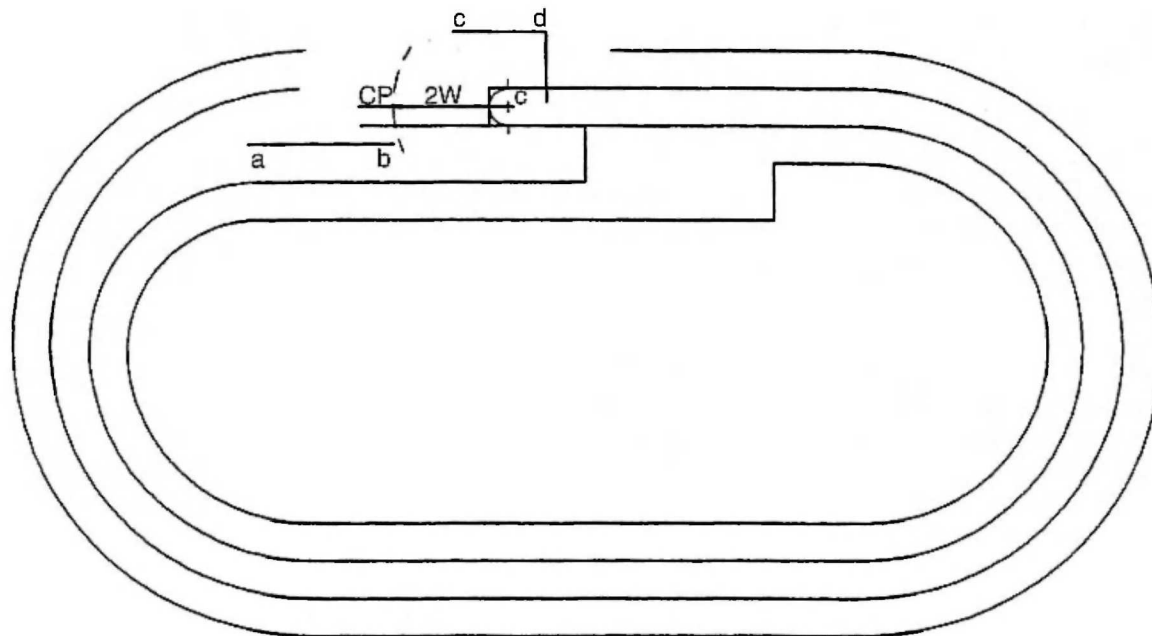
Crest lines and the crest point for bench 2 (Step 3).
